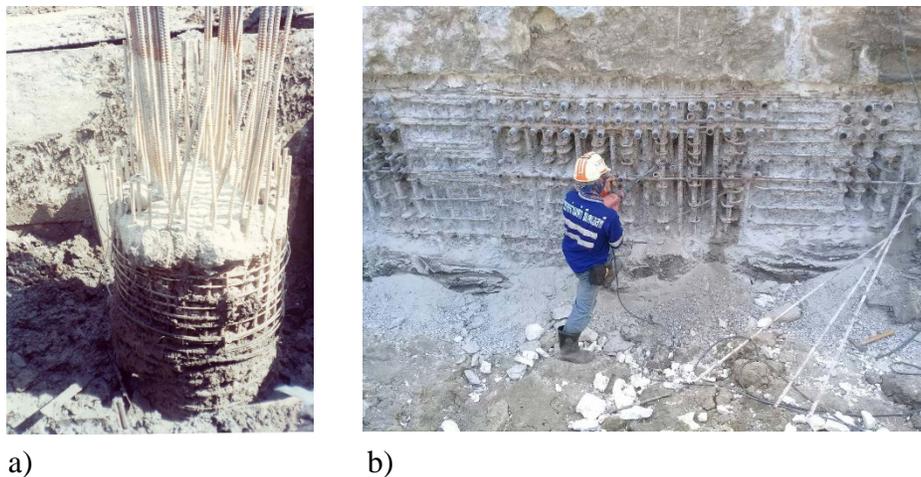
Effects of dense rebar in a) Bored pile and b) Diaphragm wall.
